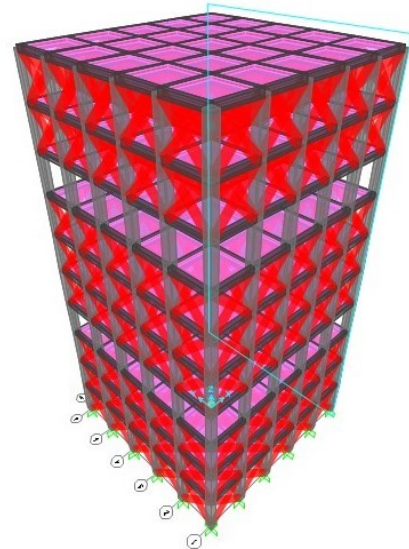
3D view of brick wall infilled building with soft storey at 4th and 8th floor.
